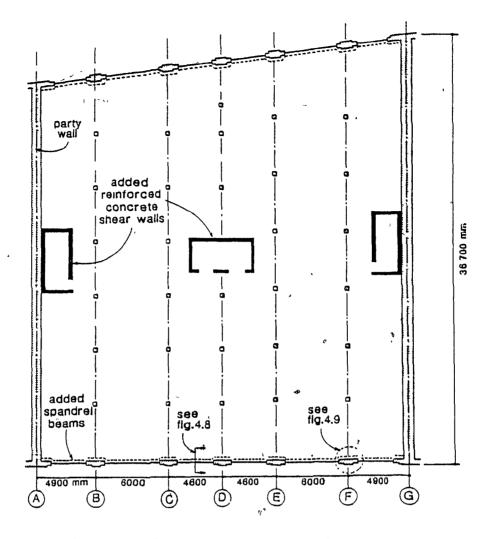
Plan View of Seven-Storey Office Building at 550 Beatty Street in Vancouver.
